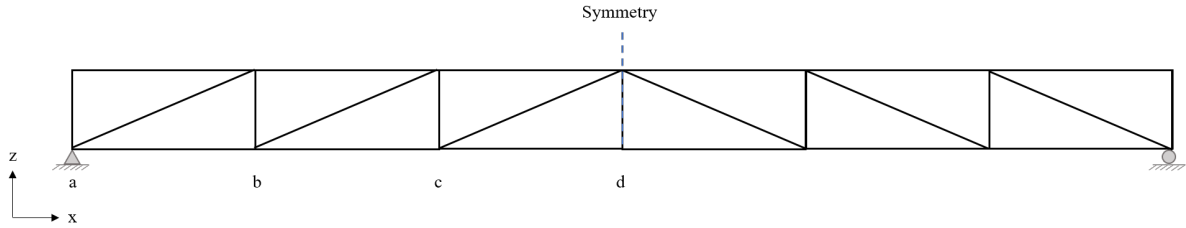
Position identifications of the truss elements for the Howe truss bridge.
